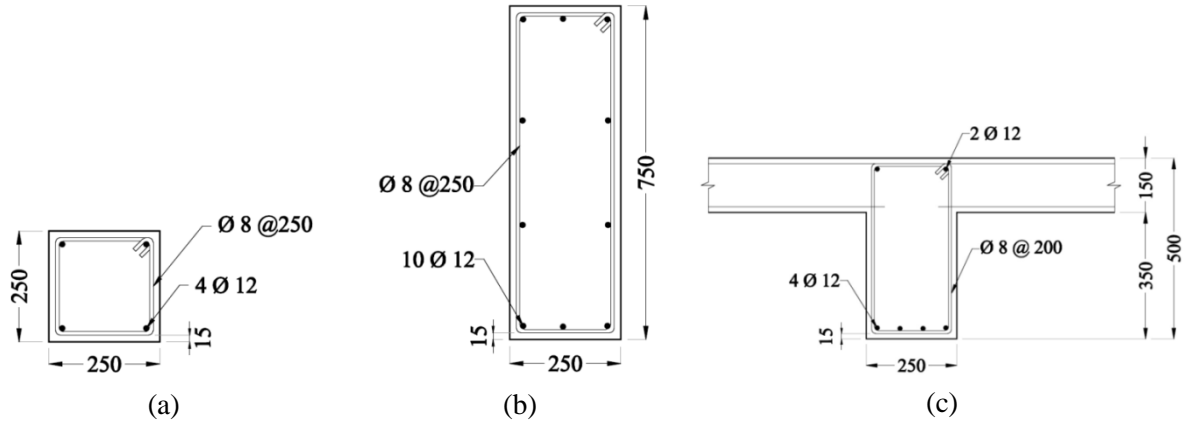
Details of the typical cross-sections of the SPEAR structure (a) square column, (b) rectangular column, and (c) beam (all dimensions are in millimetres).
